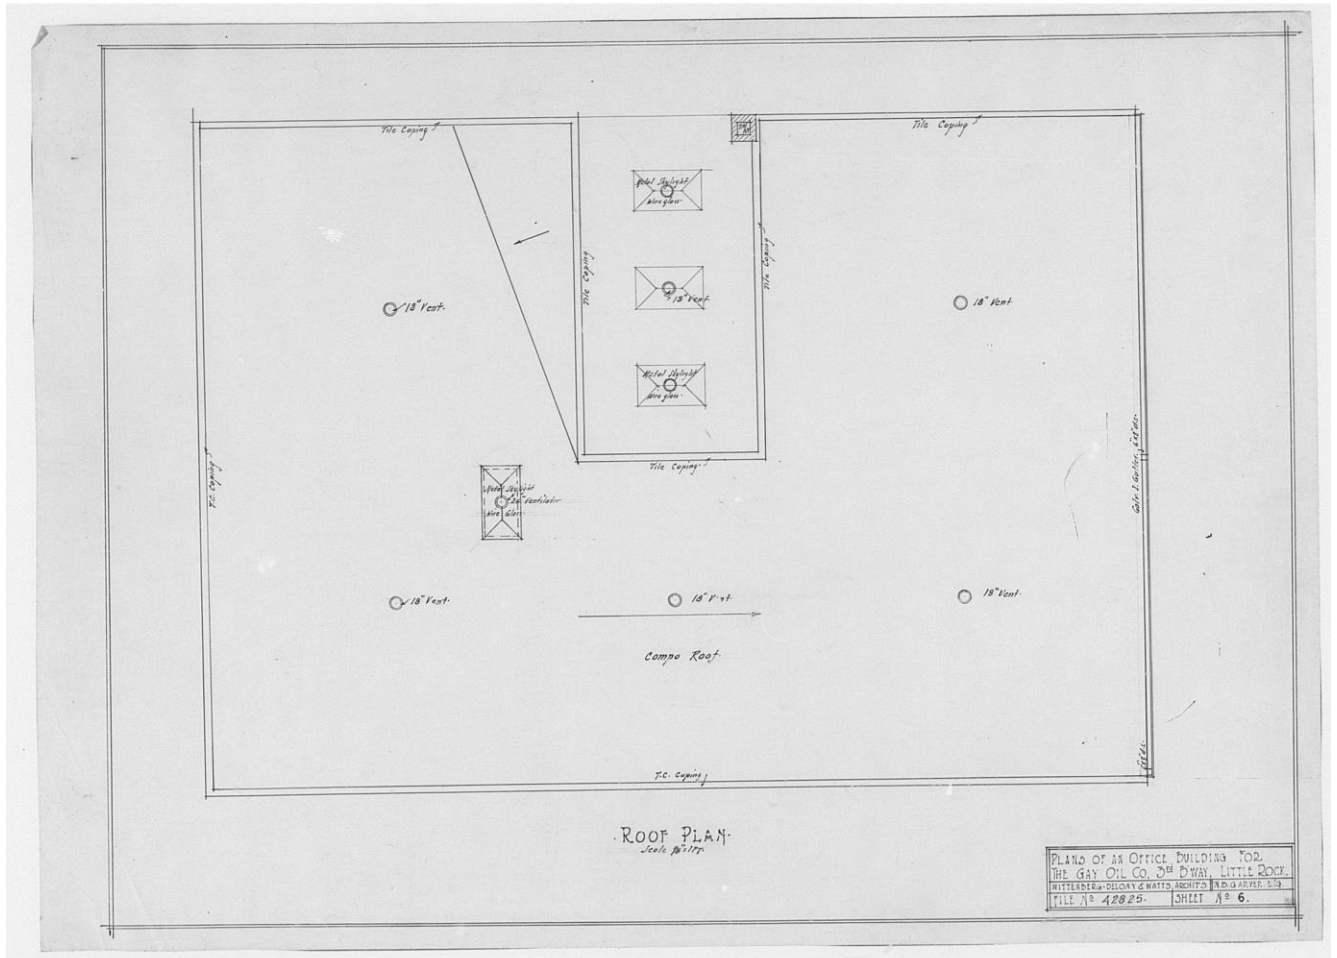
Roof Plan Drawing for the Gay Oil Company Building
